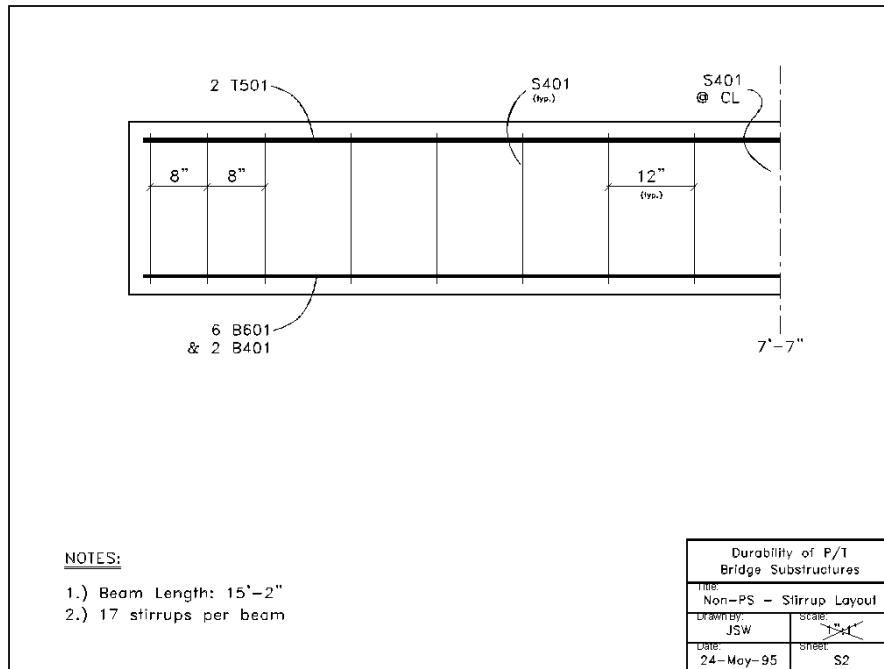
Sheet S2: Non-PS Stirrup Layout^{4.2}
